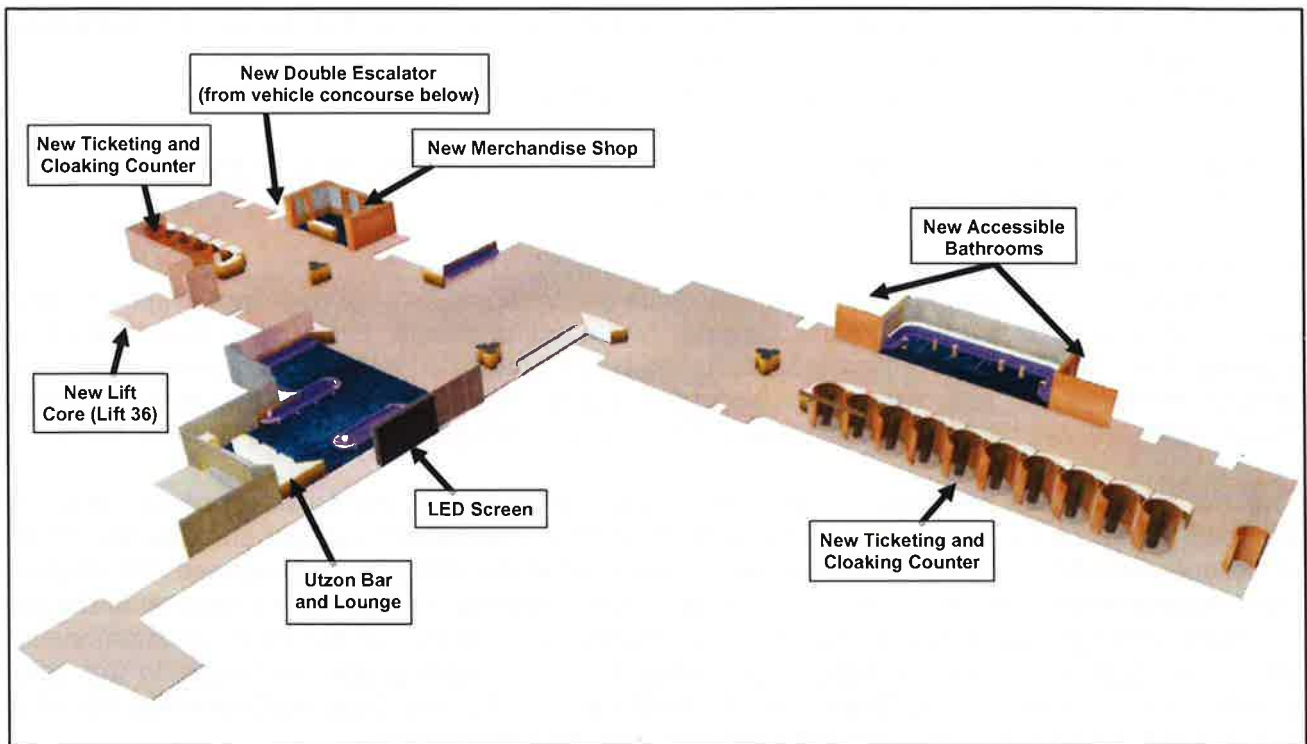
Layout of proposed entry foyer refurbishment (Source: EIS)
